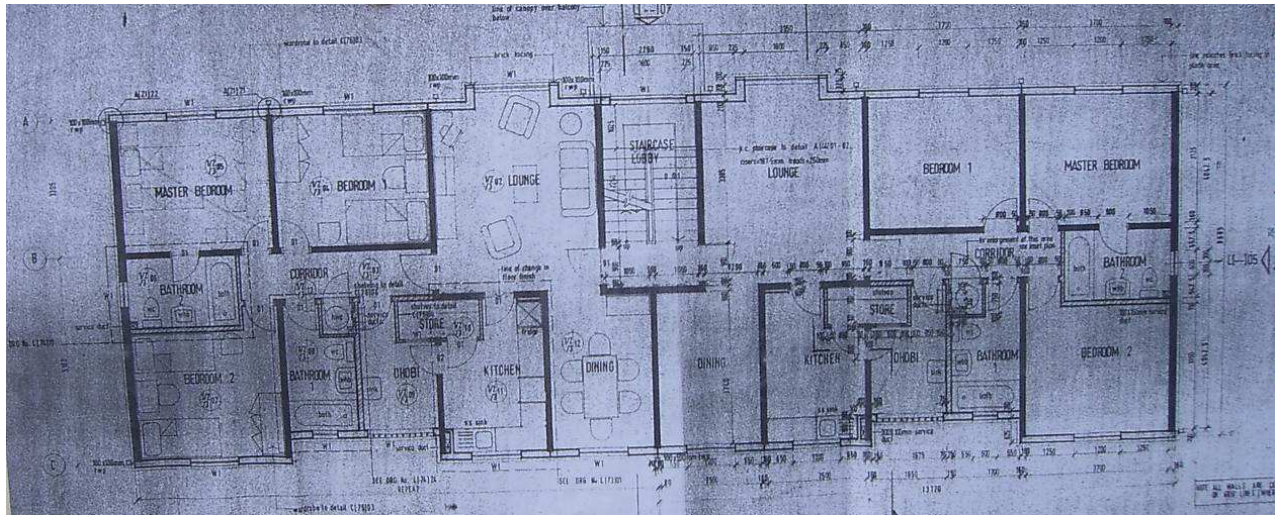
Floor plans for typical Flats
